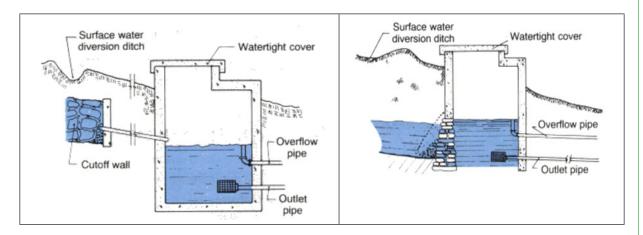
(a) Cross sectional view of a con-	(b) Cross sectional view of a spring box
